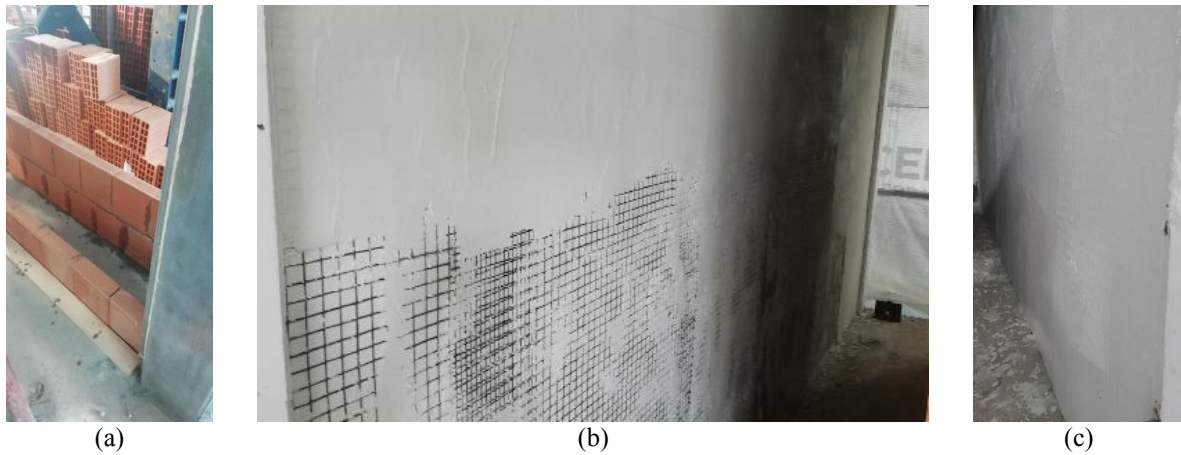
Interventions on masonry infills: (a) first-story infill reconstruction; (b) in-plane infill enhancement with basalt-fiber mesh and mortar; (c) in-plane enhanced infill after completion.
